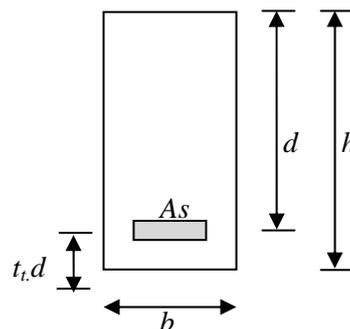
Singly Reinforced Concrete Beam Cross-Section Details
